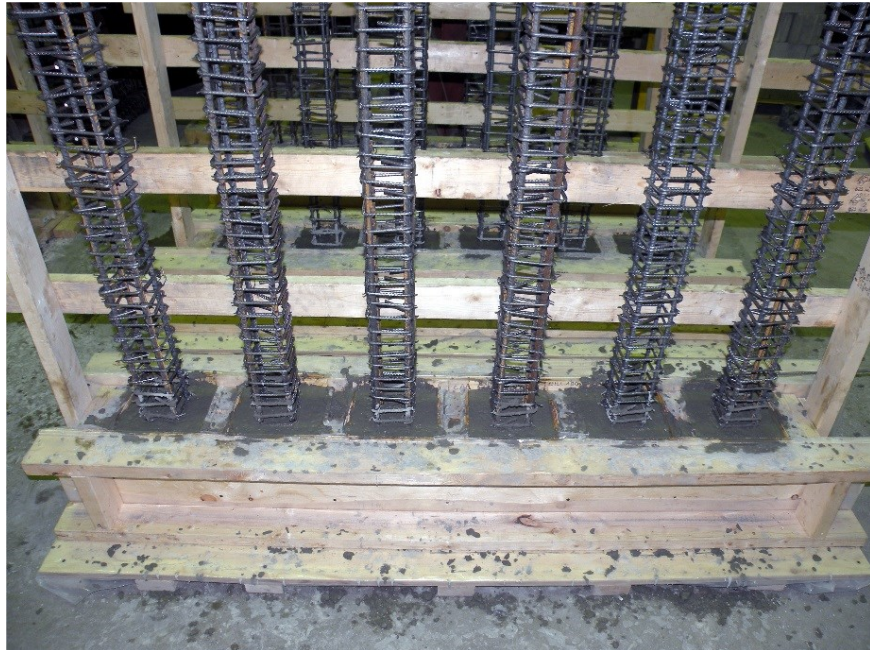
Bottom RC footing formwork for full-scale RMBE
